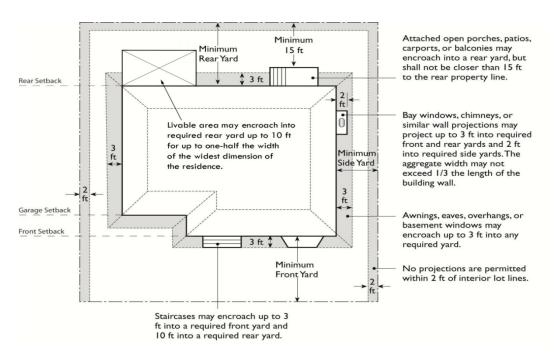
AB(2): BUILDING PROJECTION
